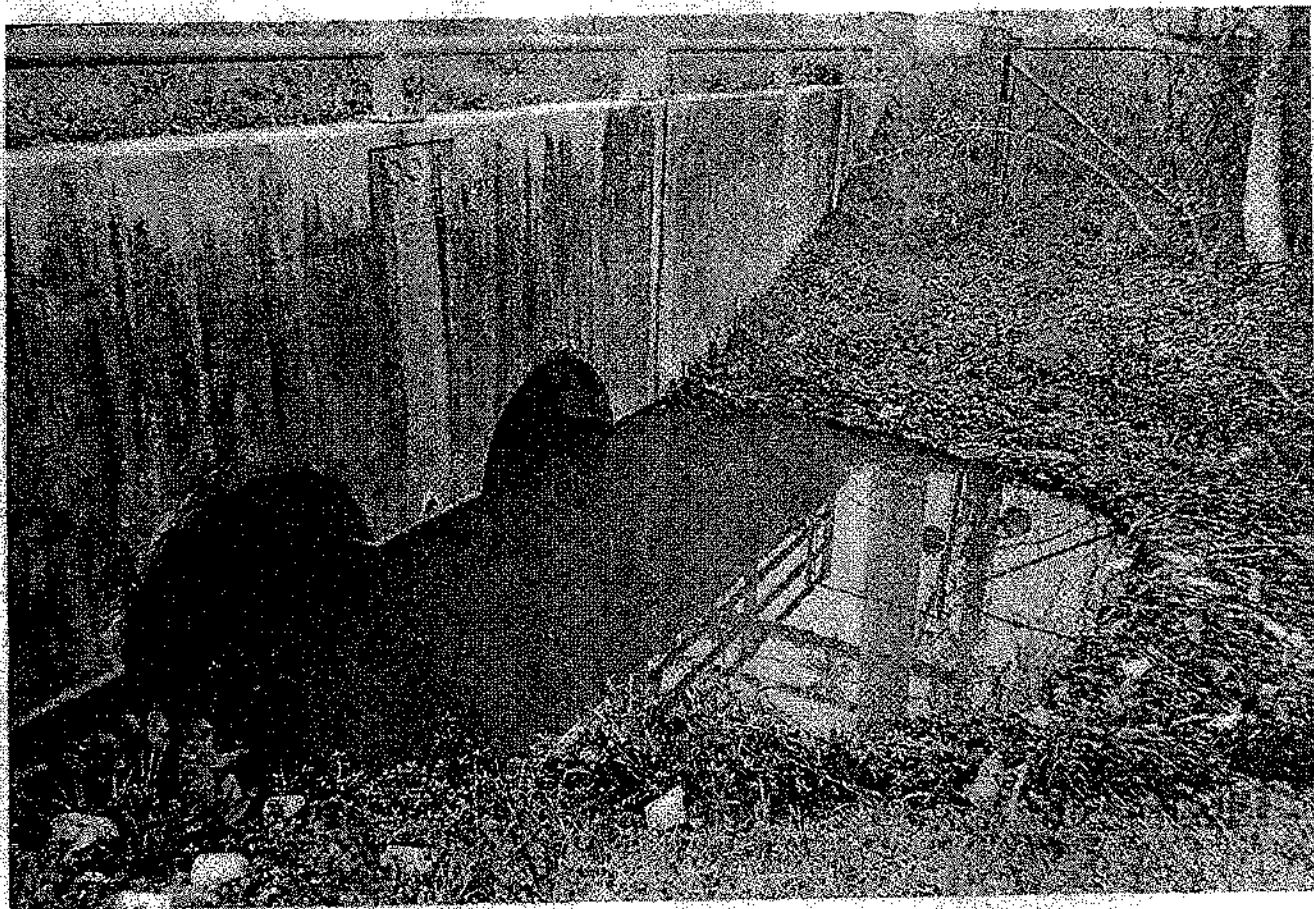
Bridge near sampling location at Hunter park at Willow Glen Road. (Note the date on the bridge is 1994).
